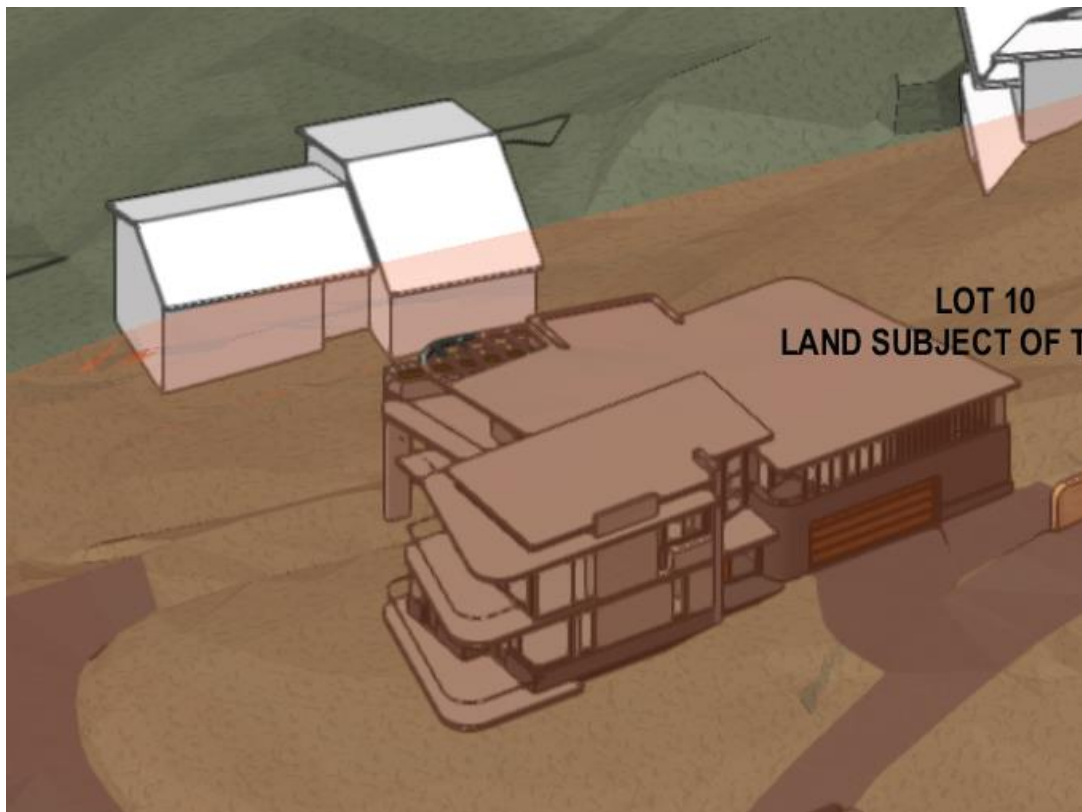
3D 8.5m building height plane over site (fully complies)
